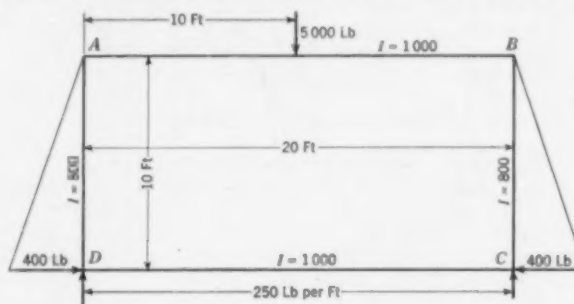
CULVERT LOADING FOR TYPICAL EXAMPLE
